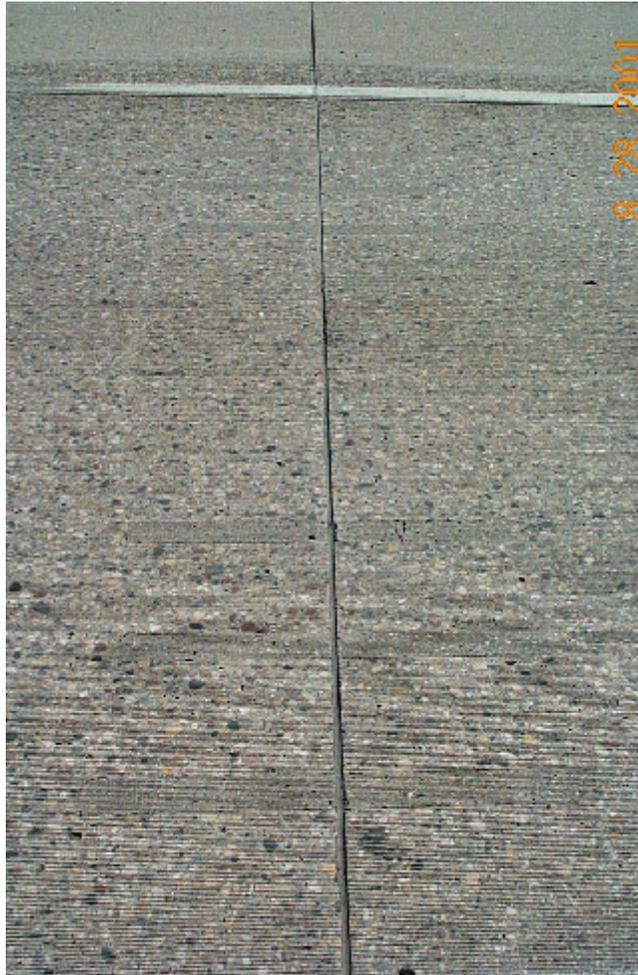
Typical retrofitted joint where 3U18 mix was used. Note the shrinkage crack in the 3rd joint.
